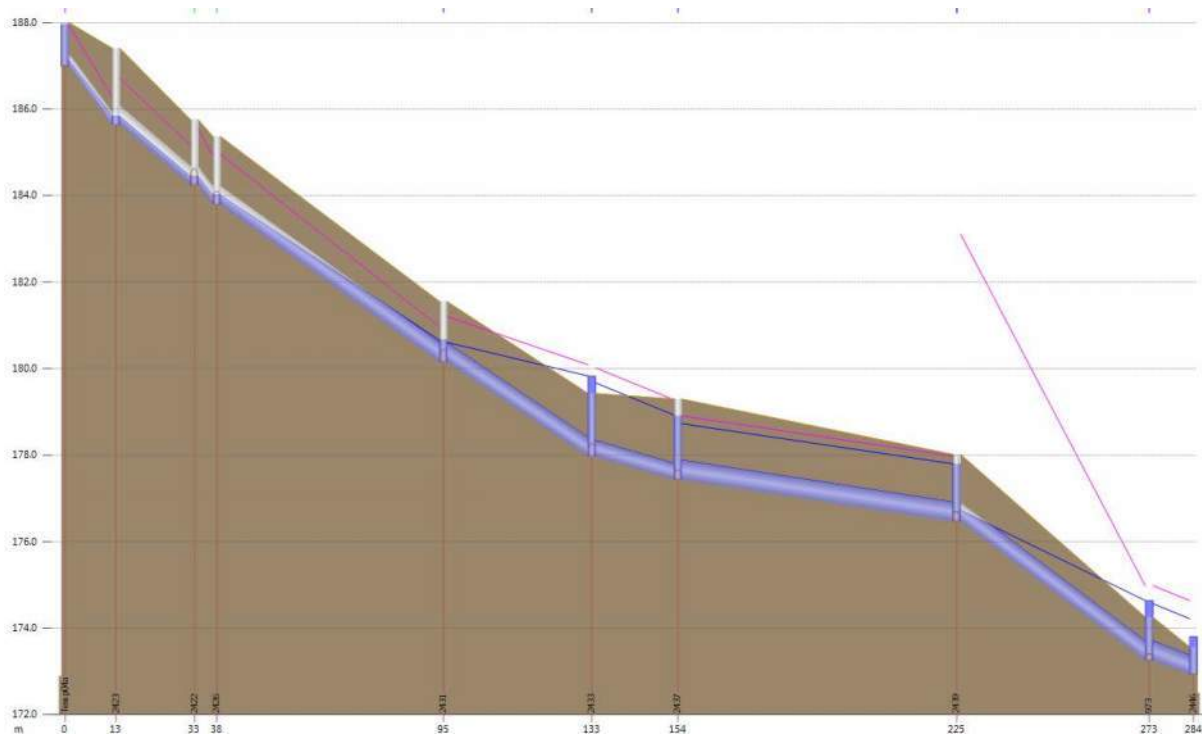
20 yr 1 hr Long section from top of Buell Drive to outlet headwall (pre-development)
